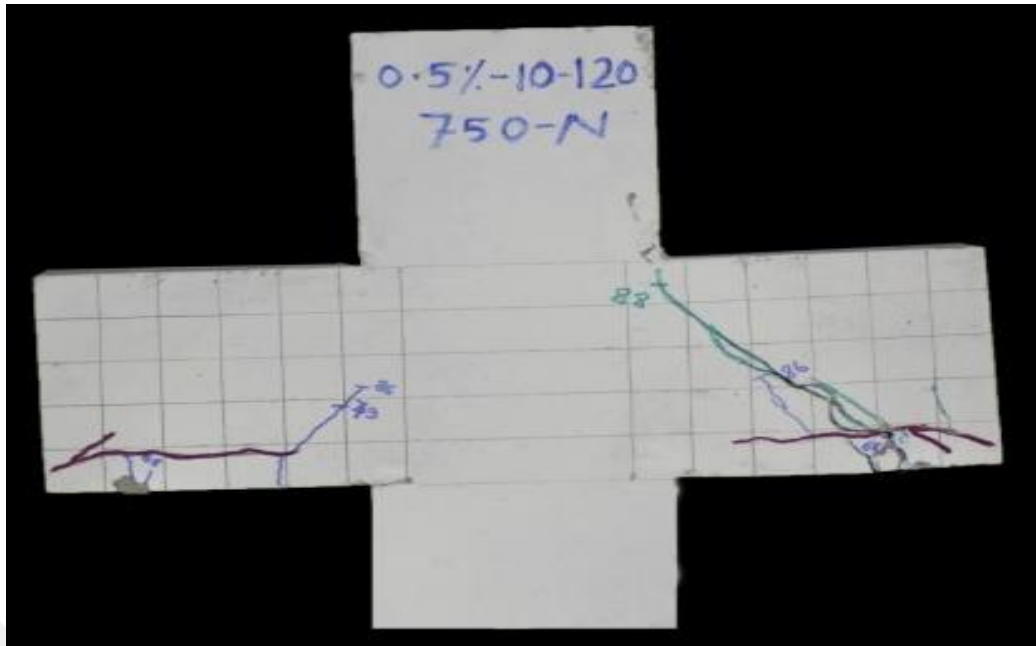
Specimen (C5-0.5-500 ) failure after repairing
